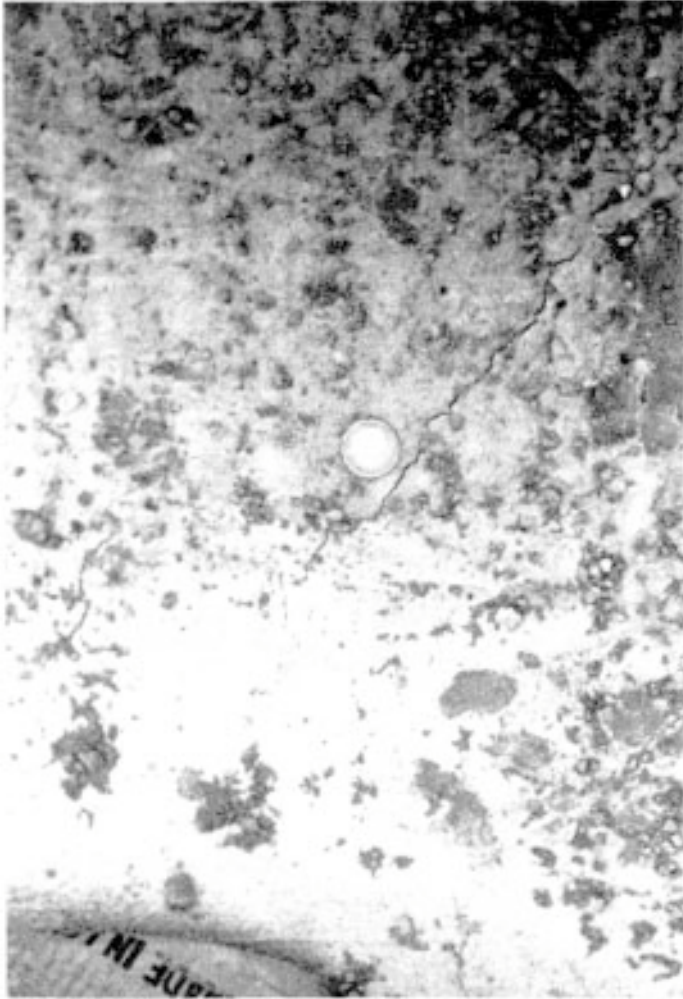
Example of plastic cracking in a floor slab.
